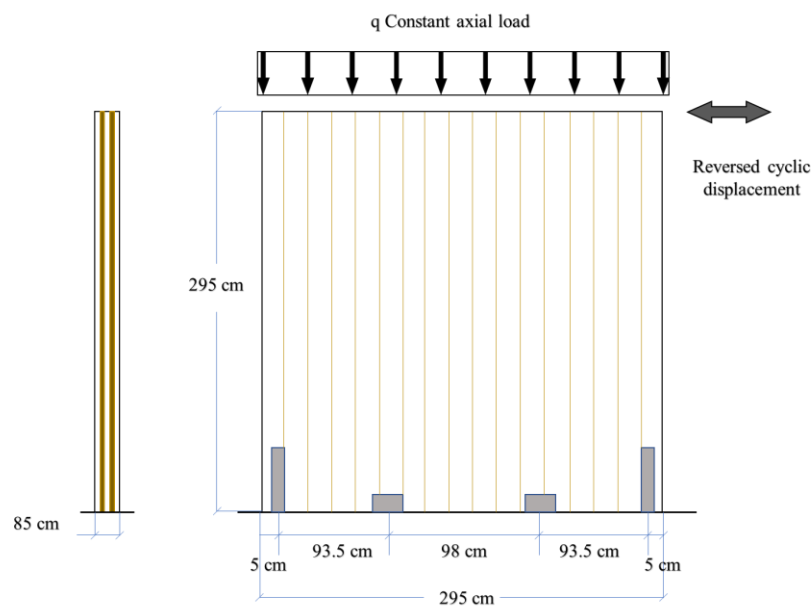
Wall 1.1 configuration (Gavric, 2013)
